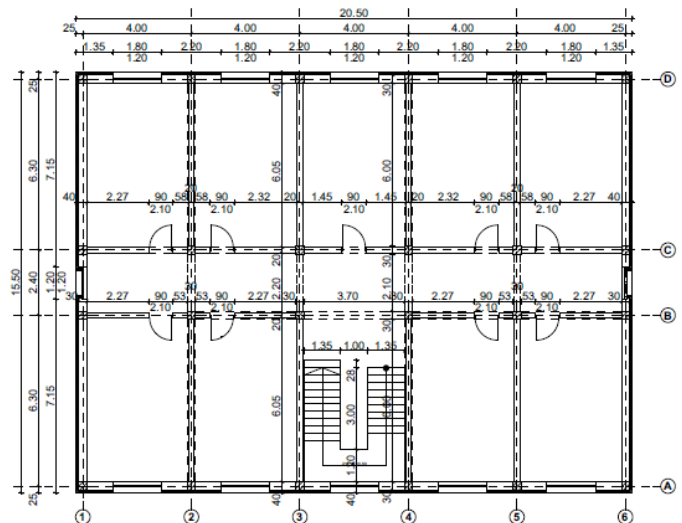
Floor layout – RC frame structure with masonry infill walls
